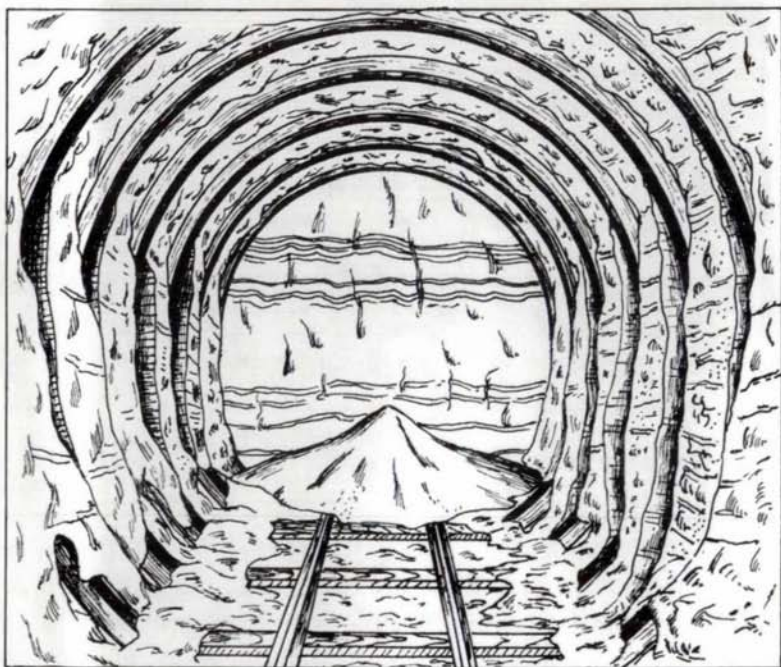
Sketch of a tunnel in St. Peter Sandstone.
